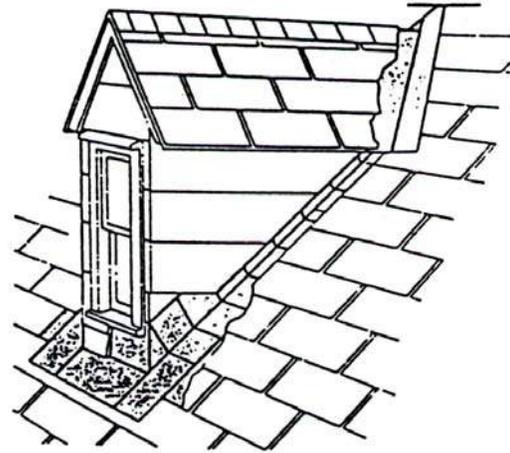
Step flashing under wood siding and the other woven into the roof shingles
